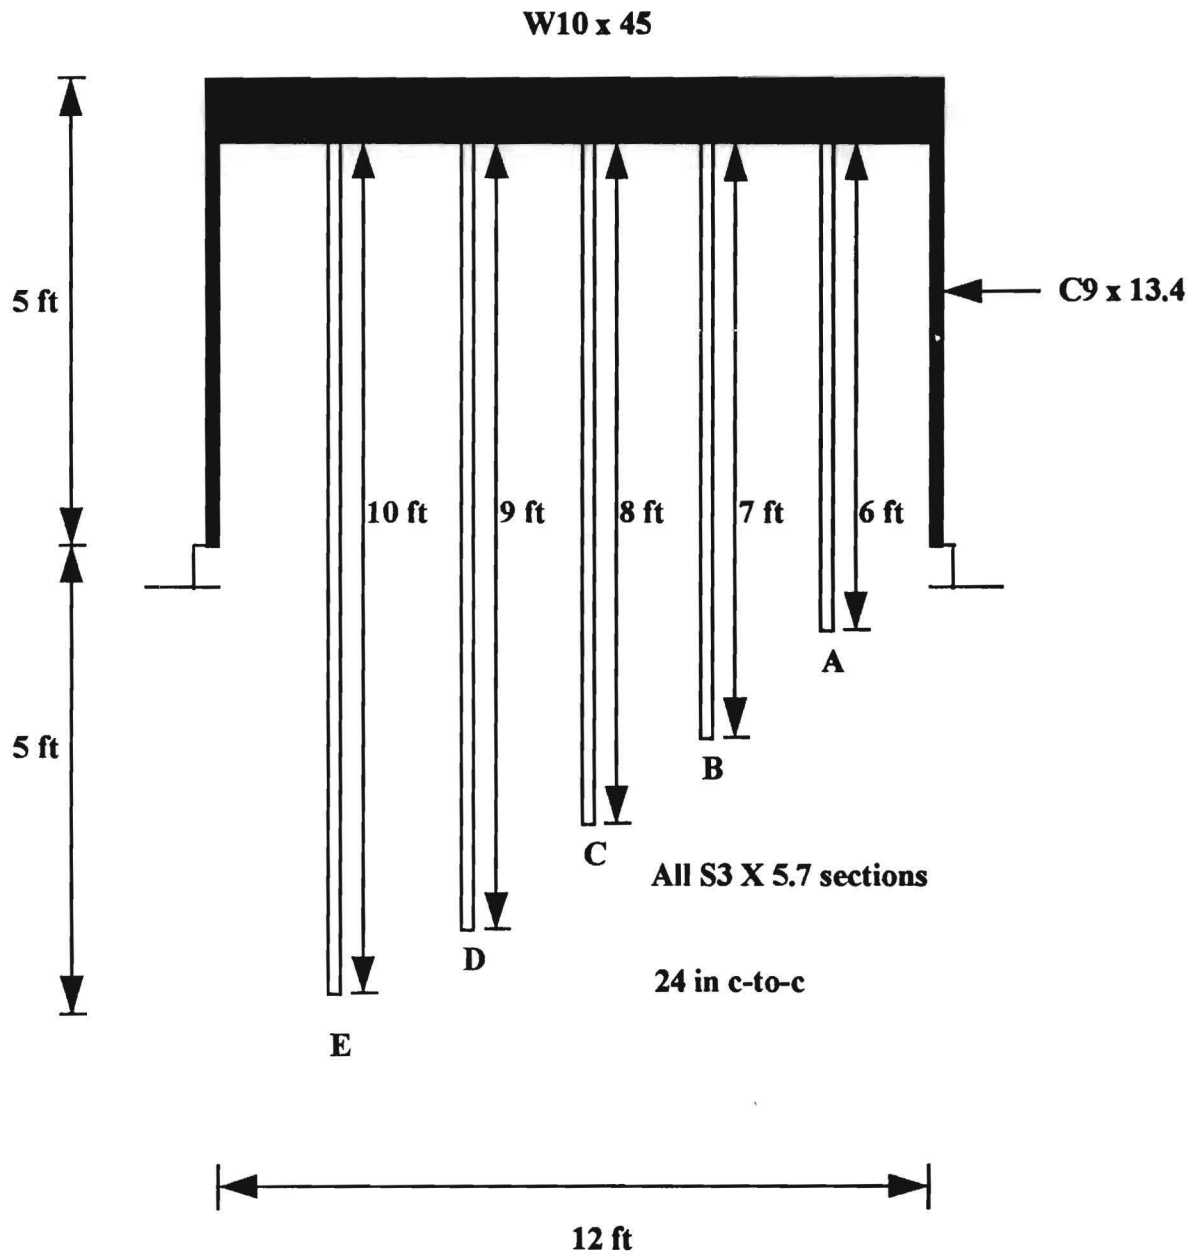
Right Elevation View of Small-Scale Pile Test Facility
